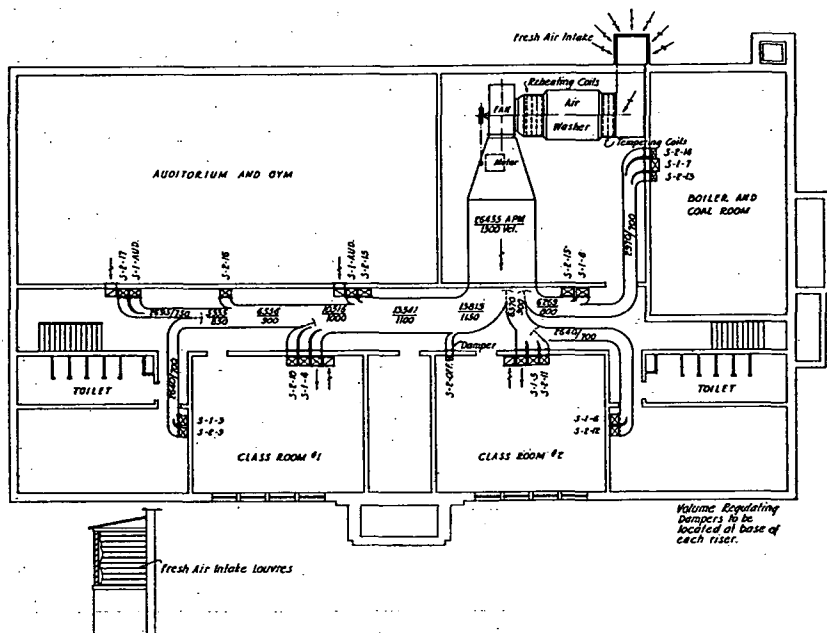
BASEMENT PLAN METAL DUCT DISTRIBUTION TYPICAL SCHOOL LAYOUT
